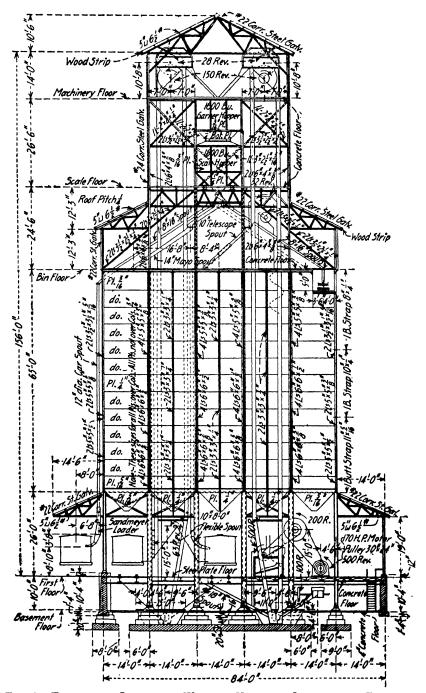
TRANSVERSE SECTION OF WORKING HOUSE OF INDEPENDENT ELEVATOR.
